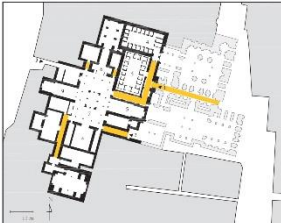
Floor plan of El-Mansouri Bimaristan. (Ragab, 2015)
